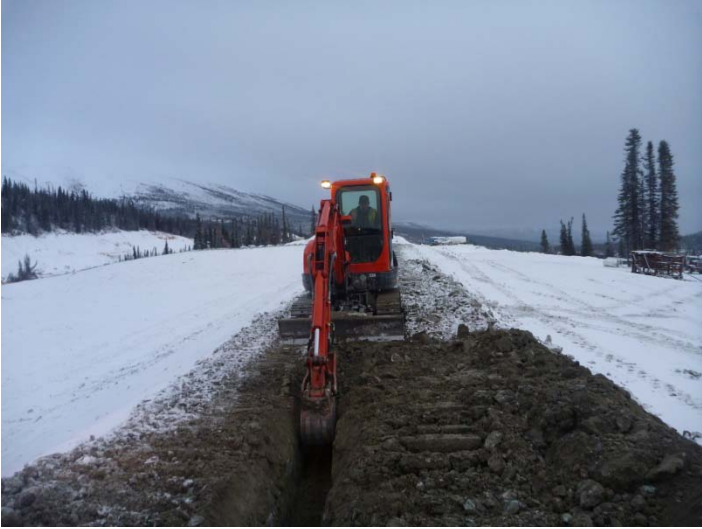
(11/10/21) The french drain runs under the Pad and exits here (south end) through a culvert. Is working great.
